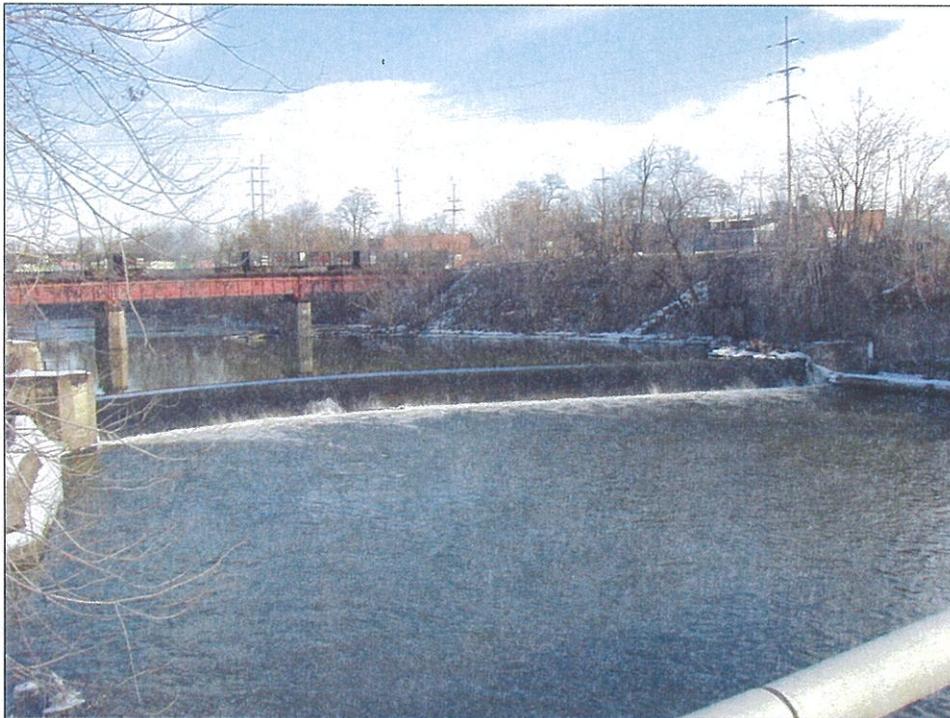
Warren Water Works Dam. View of dam looking north from Summit Avenue bridge.
